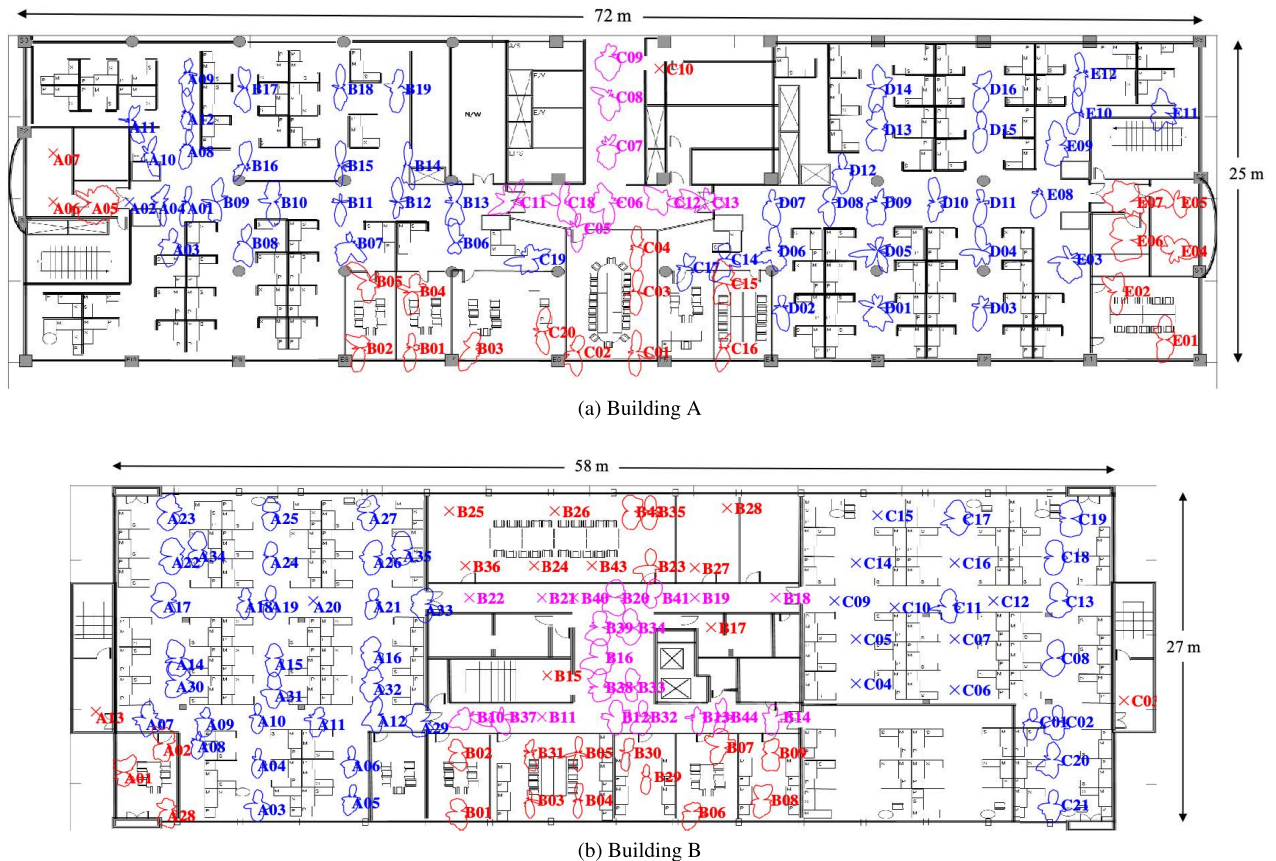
Illustration of power angular profiles with building inside layouts (TX located to the bottom of the facade).
